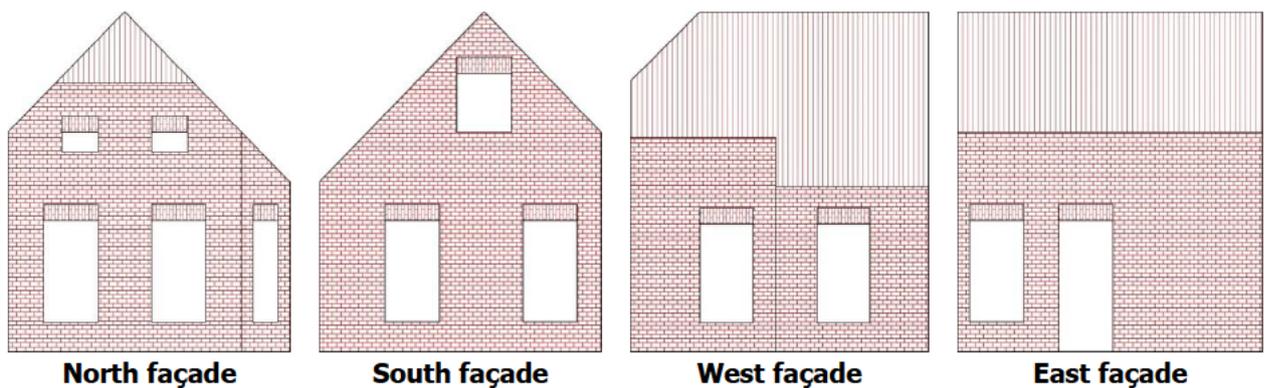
Layout of the façades of reference building EUC-BUILD-2, as studied in the current work.
